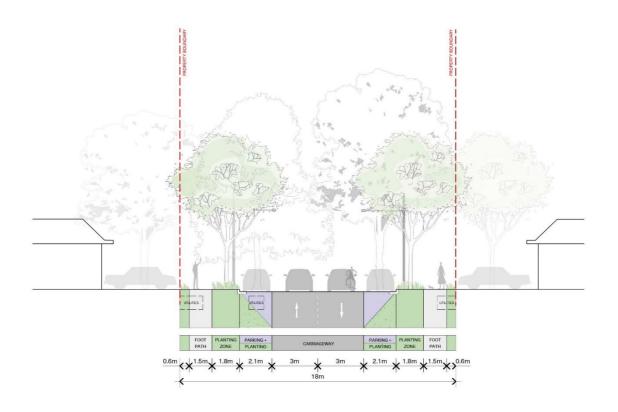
Neighbourhood Street cross-section (1:200@A4 scale)
